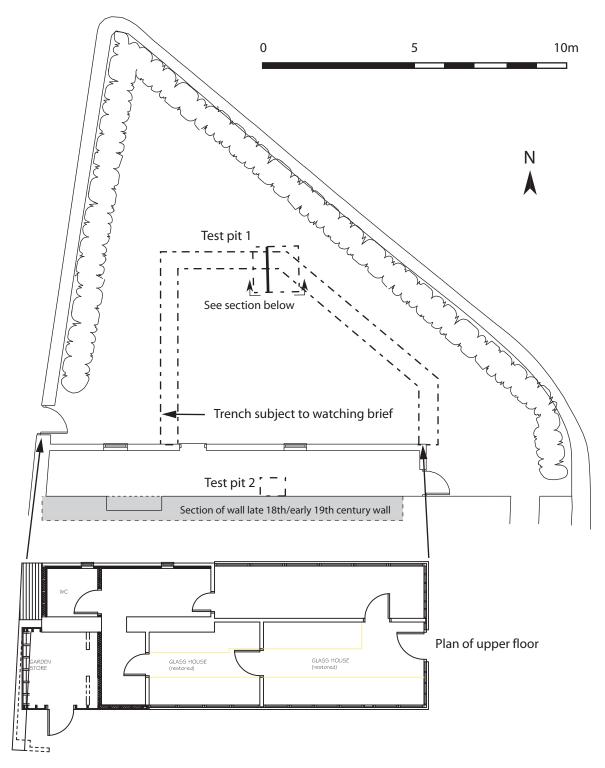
Plan showing location of test pits, existing buildings and footings subject to watching brief. (based on plan provided by Conservation and Design, Shane Maddison).
